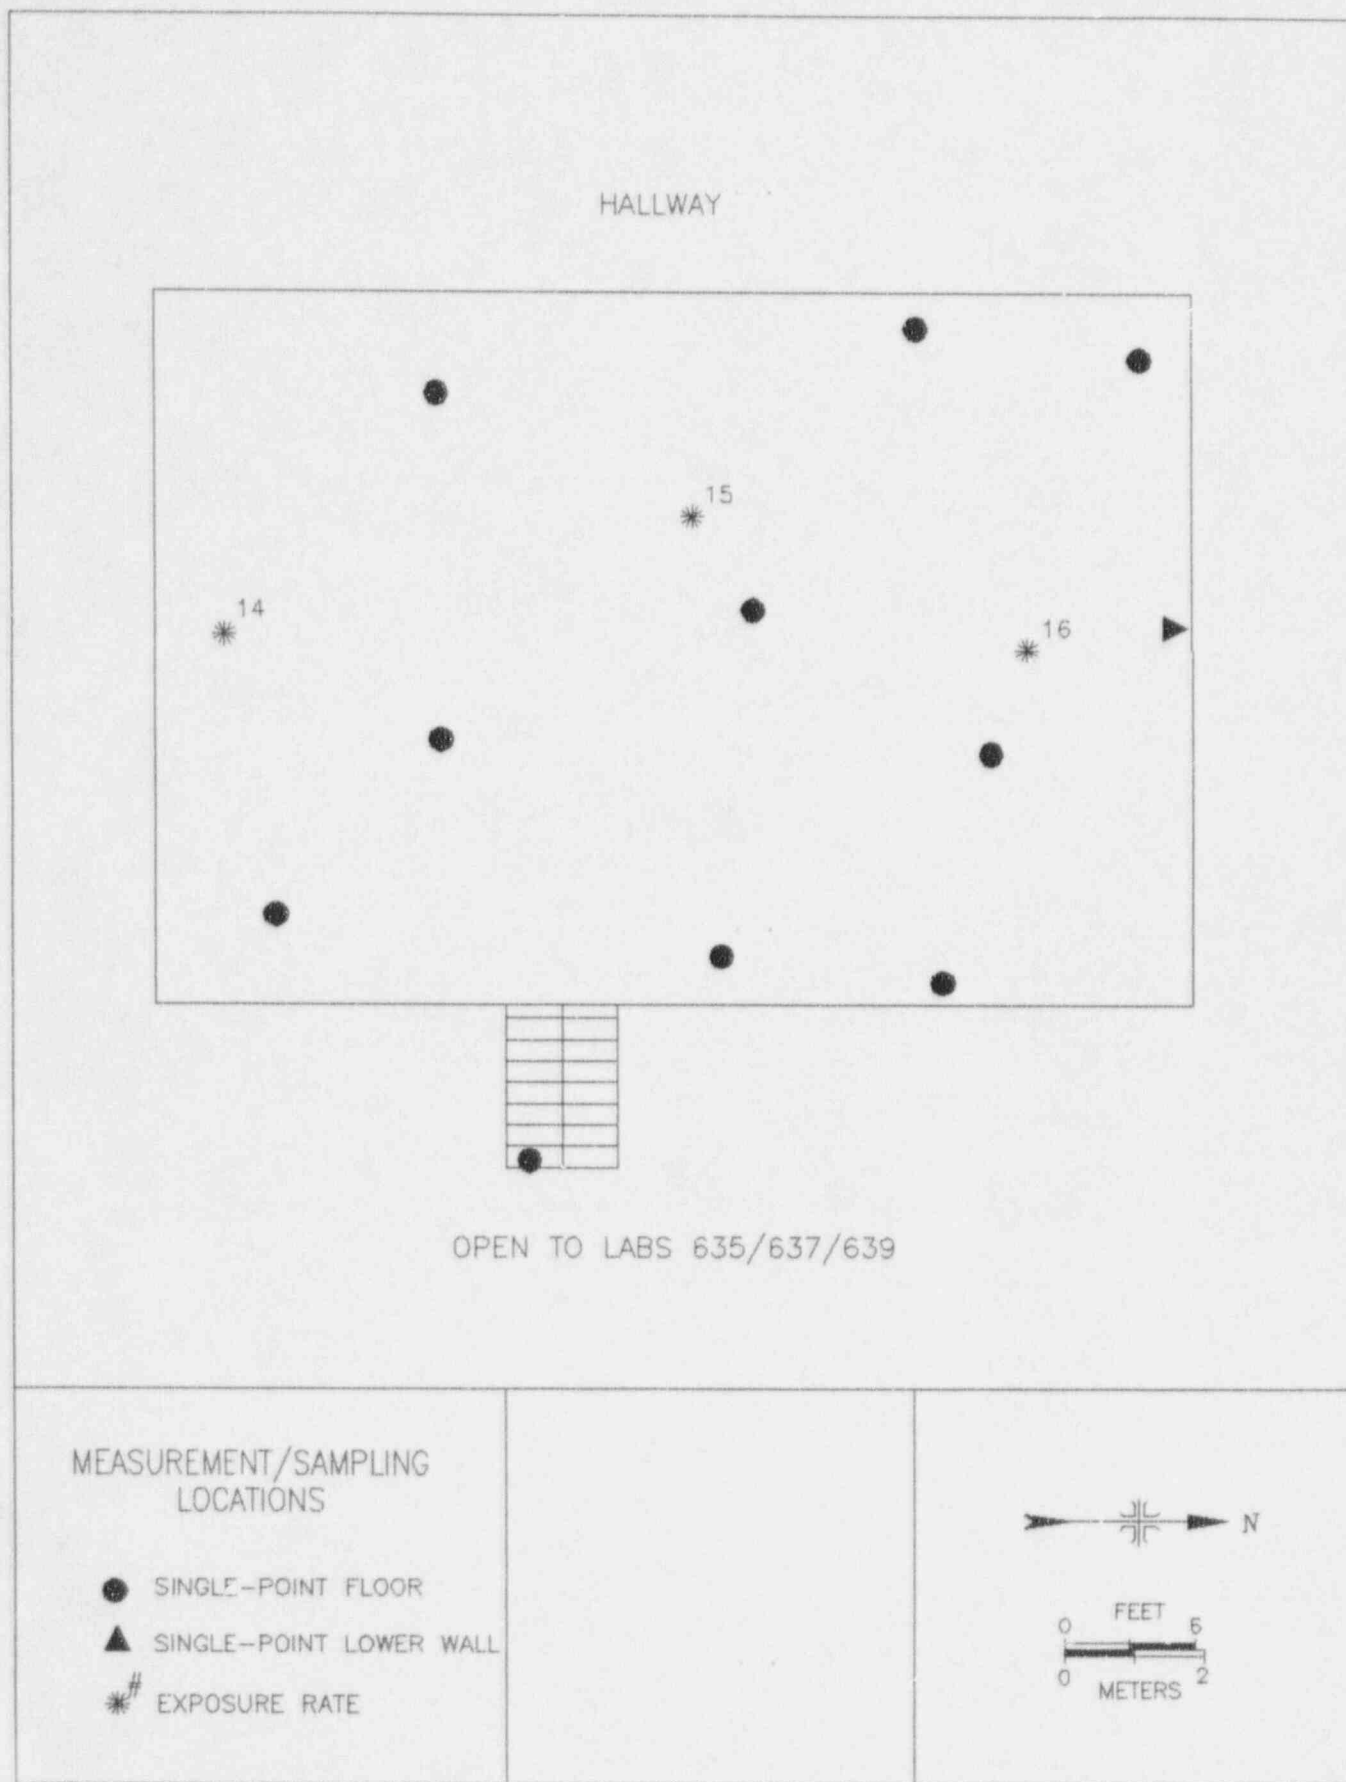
Building 2, Mezzanine above Rooms 637/639 – Measurement and Sampling Locations
